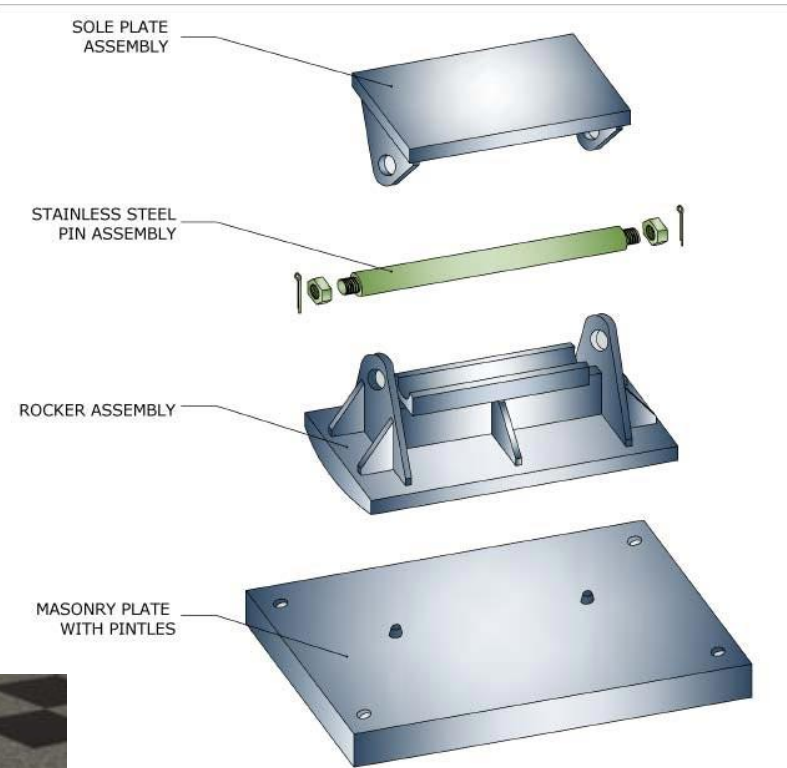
TYPICAL ROCKER "PIN" BEARING ASSEMBLY
